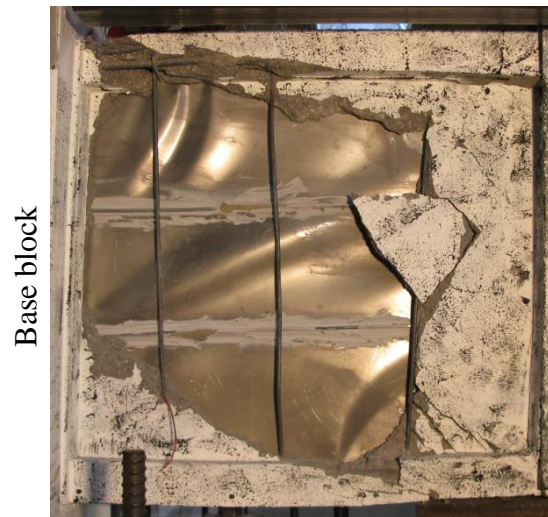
buckling of encased-plate and stirrups after failure
